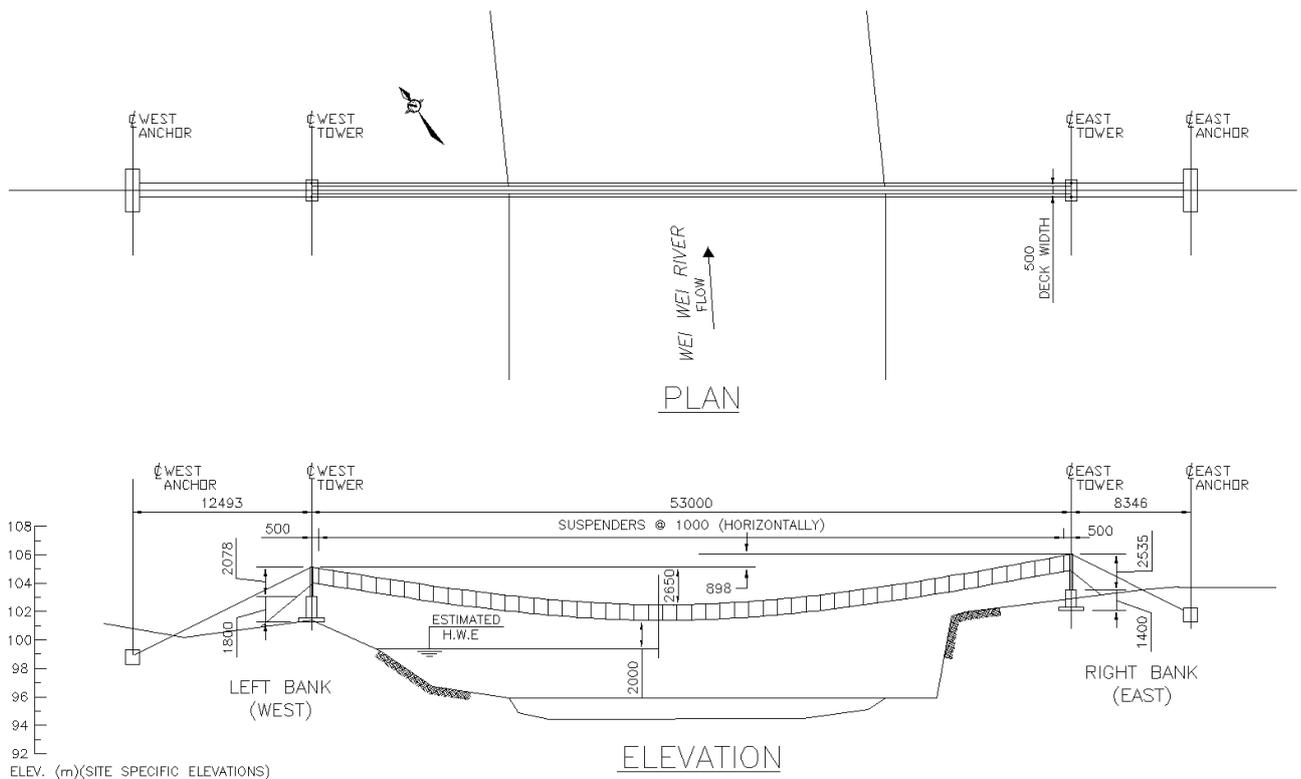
Plan and Elevation of the 53m Suspended Bridge at Sisit
